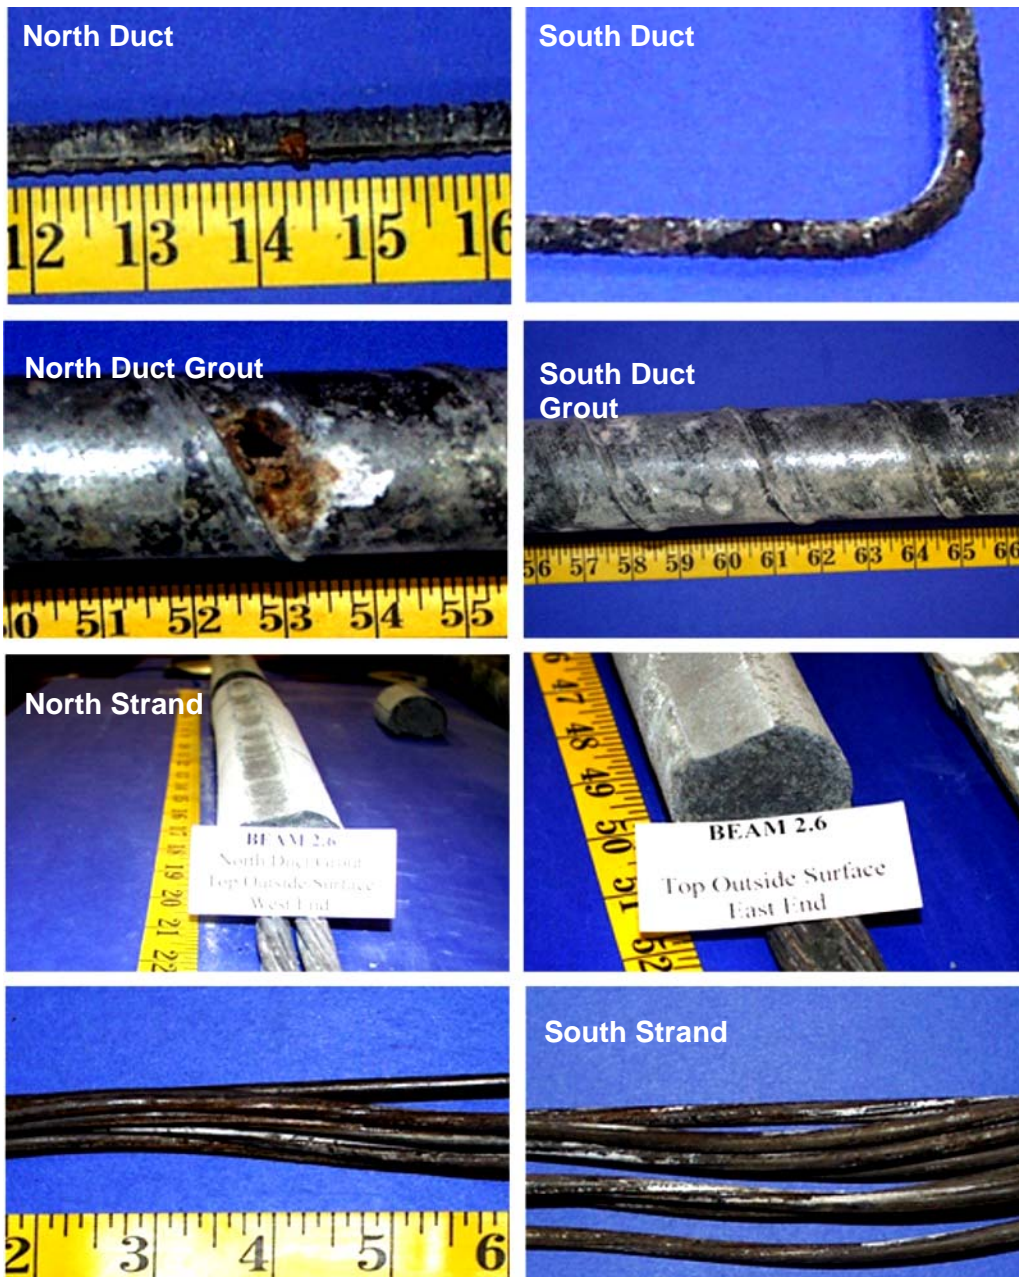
Specimen 2.6 – Reinforcing Elements<sup>6,7</sup>
